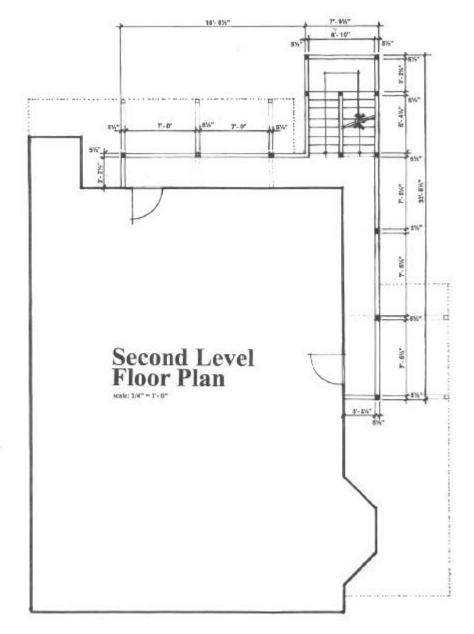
Architectural Floor Plan of proposed back porch structure, taken from Attachment 4 of this report. Depicts a change in the proposed back porch and stairwell layout.
